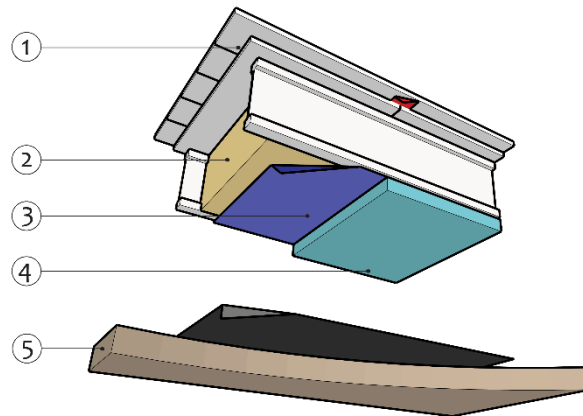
1. Timber flooring over particleboard 2. batt insulation between joists 3. airtightness layer 4. optional additional PIR insulation 5. vented subfloor cavity with vapour barrier over earth.
